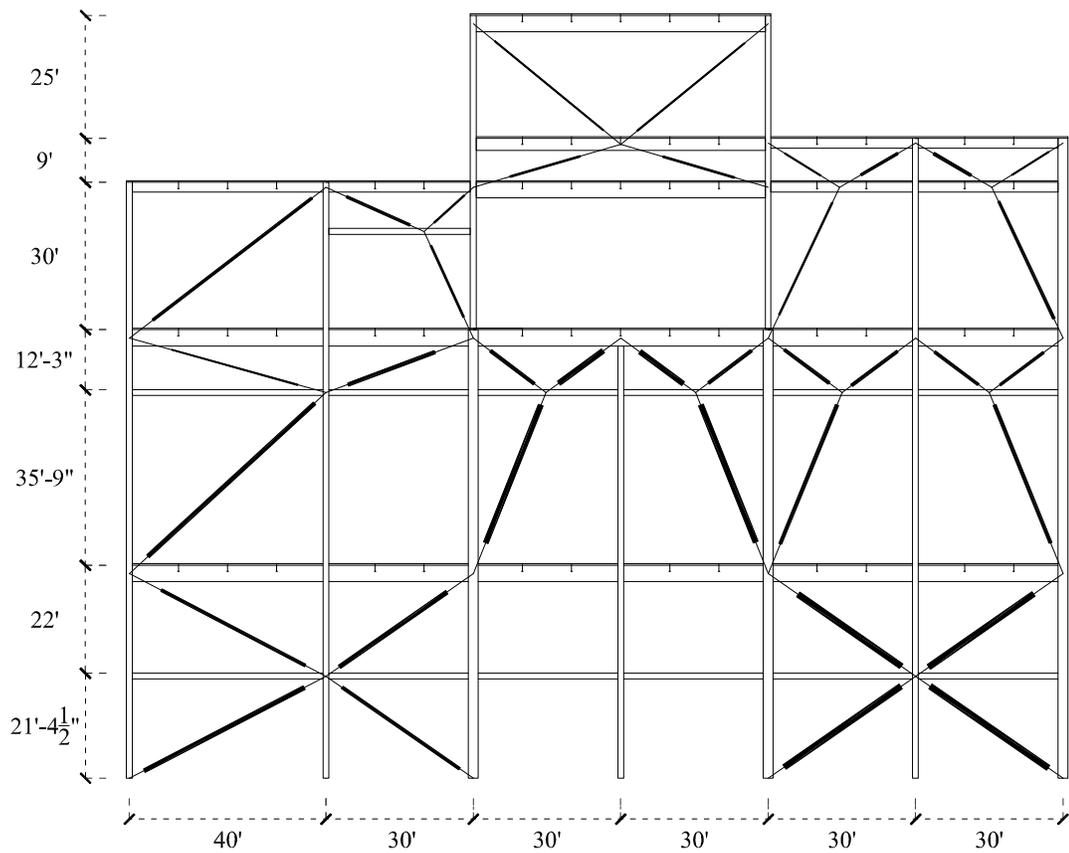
Elevation view of BRBFs of interest for Model 1
